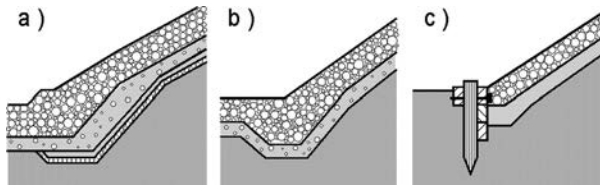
Composite construction between the rockfill protection and foundation. (a) With a rockfill prism; (b) with stone backing; (c) with stakes (or sheet piling).
